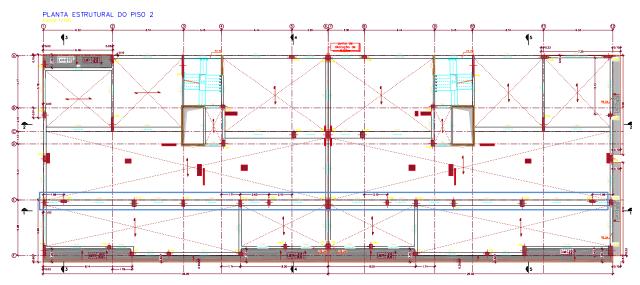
Actual structural plan and possibility of increasing flexibility.
